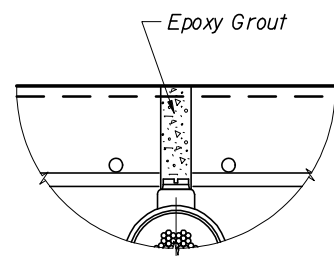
DETAIL A - FACE INSPECTED ANCHOR WITH GROUT OUTLET
